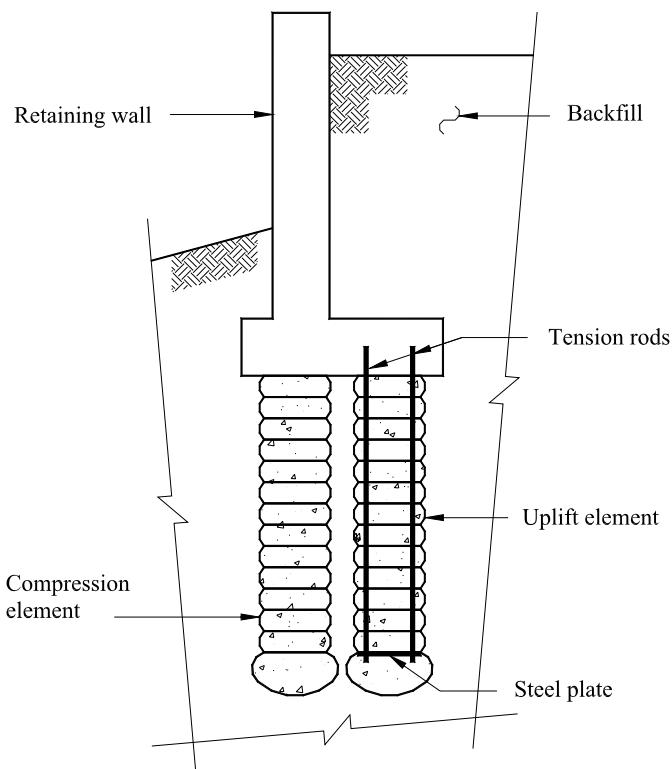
Retaining wall with Geopier uplift elements [adapted from White et al., 2001].
